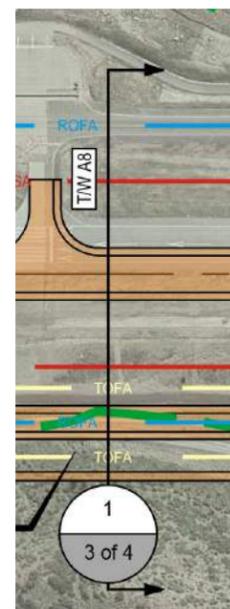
Location of West Side Pinch Point Cross Section (Typical)
